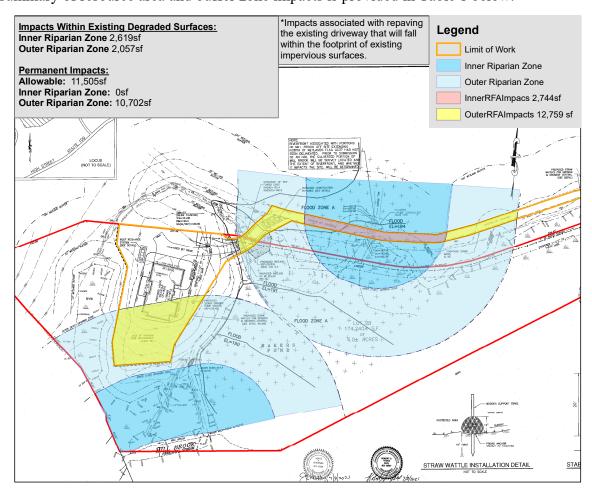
Impacts to the Inner and Outer Riparian Zones as a result of the proposed construction.
